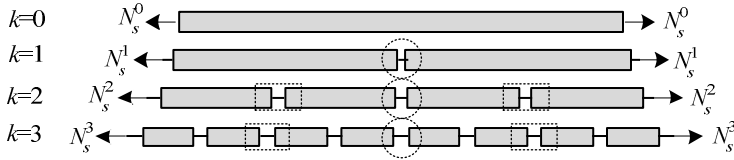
Schematic view of reinforced concrete bar cracking at different stages k
